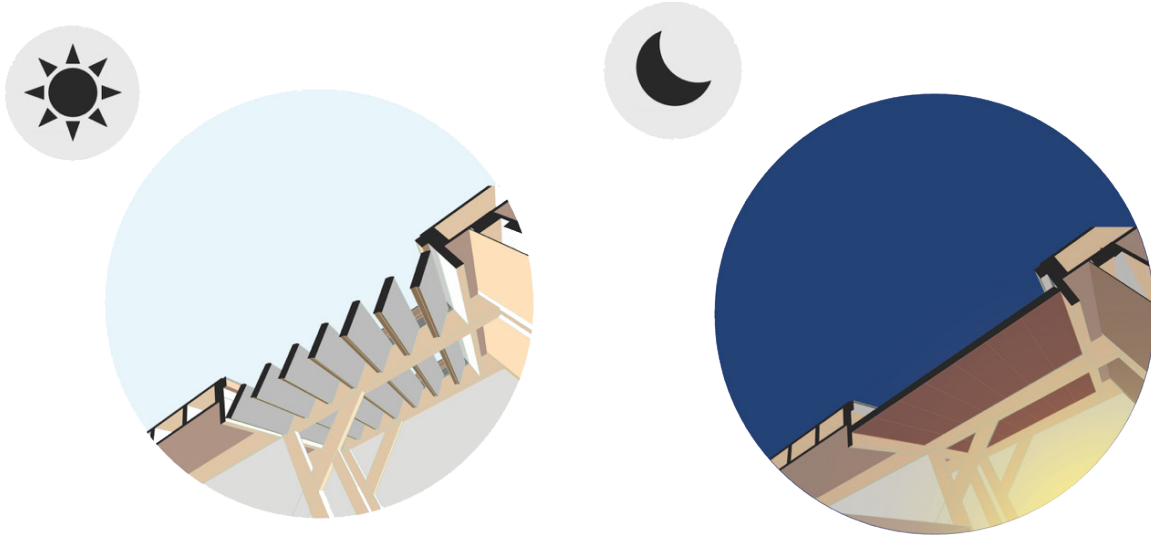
A sawtooth skylight design can be used to adjust solar heating and insulation throughout the day.
